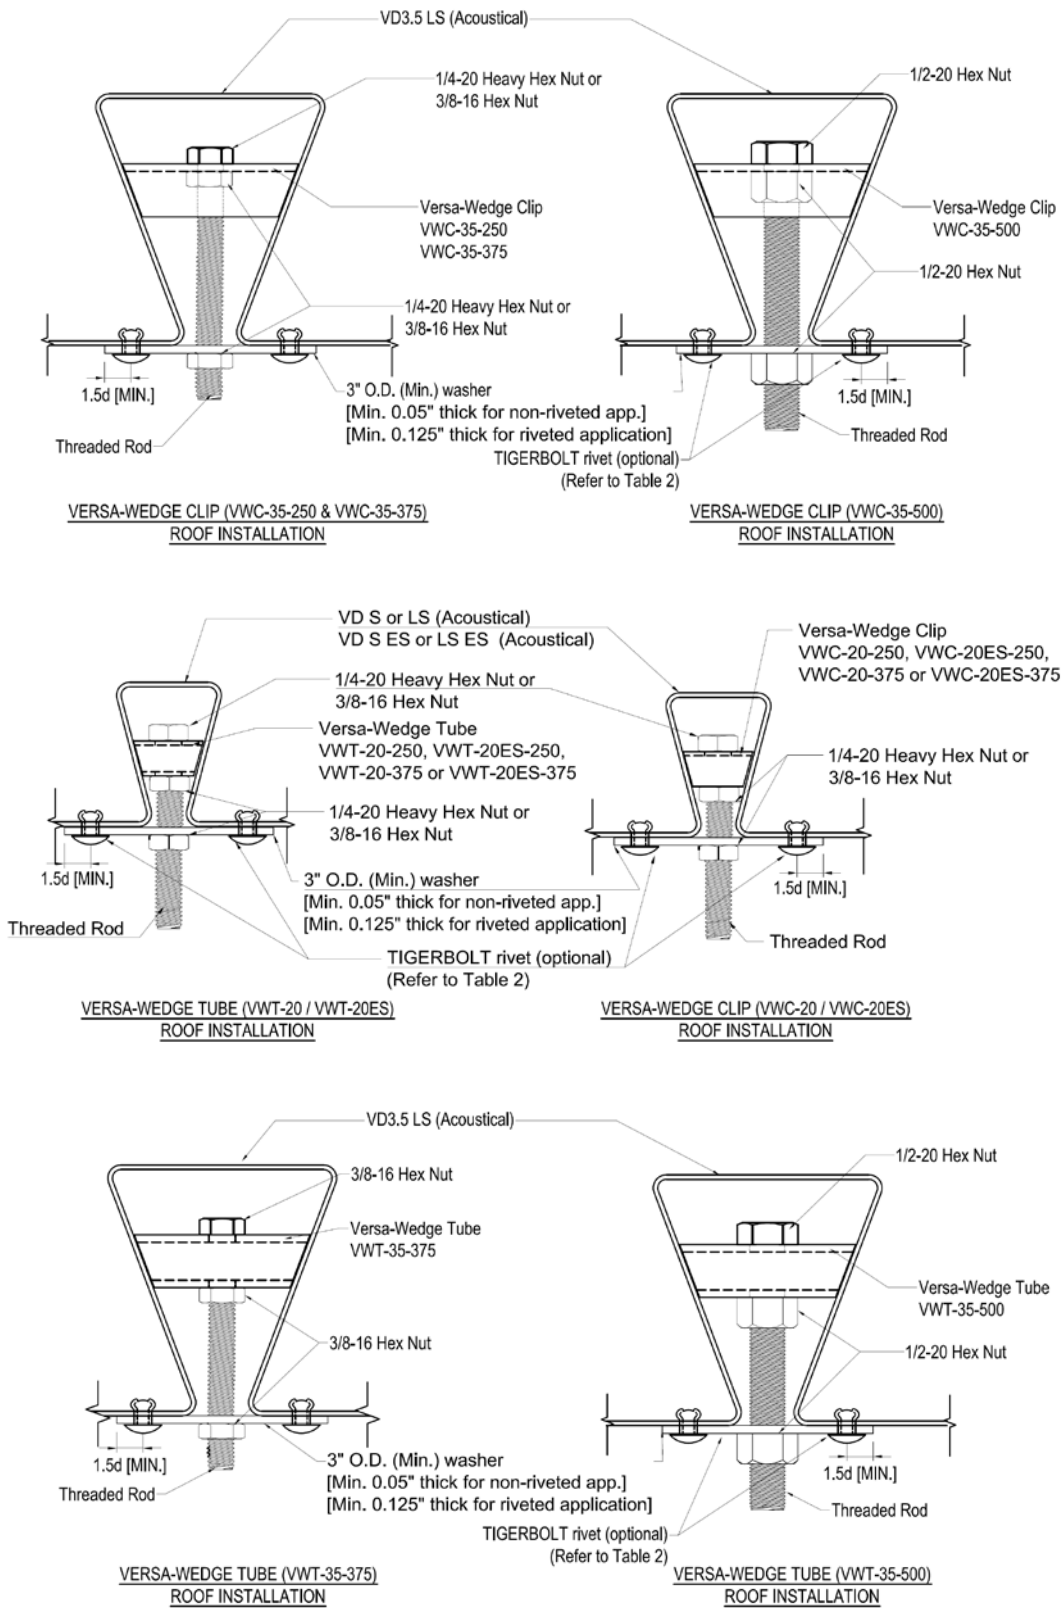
VWC AND VWT ROOF INSTALLATION DETAILS
